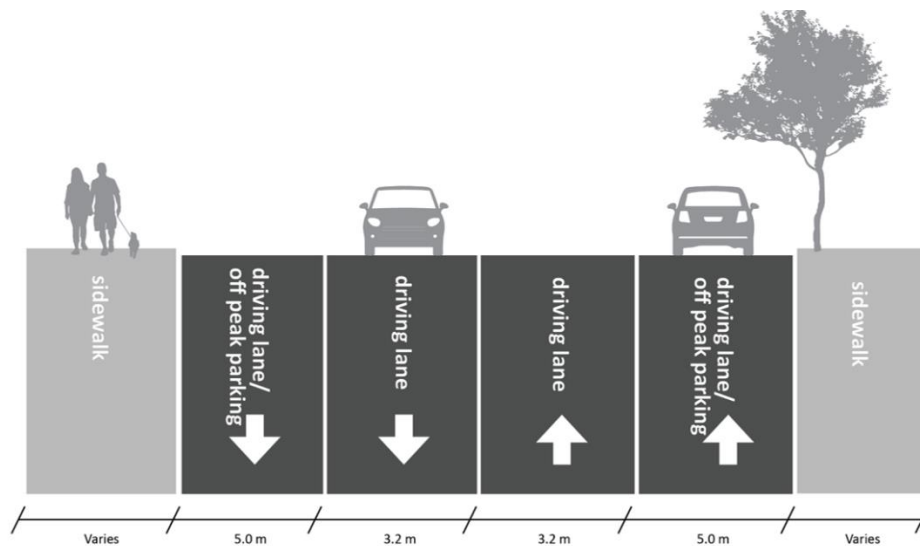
Danforth Avenue Typical Cross Section Pre-Pilot Installation
